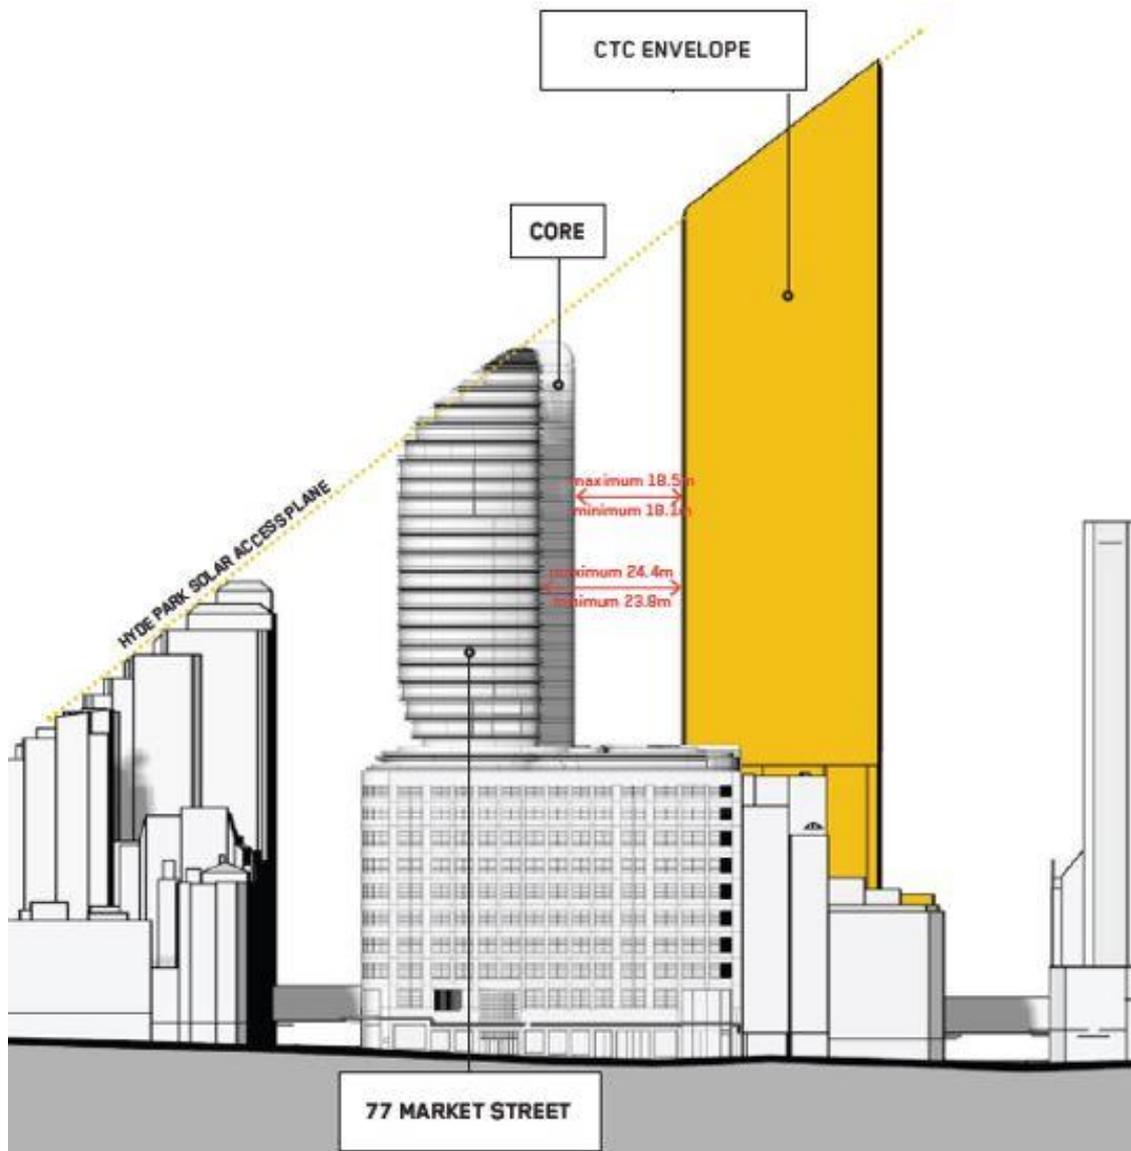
Northern (Market Street) elevation extract demonstrating separation distances between the proposed tower (in yellow) and the approved development at 65-77 Market St
